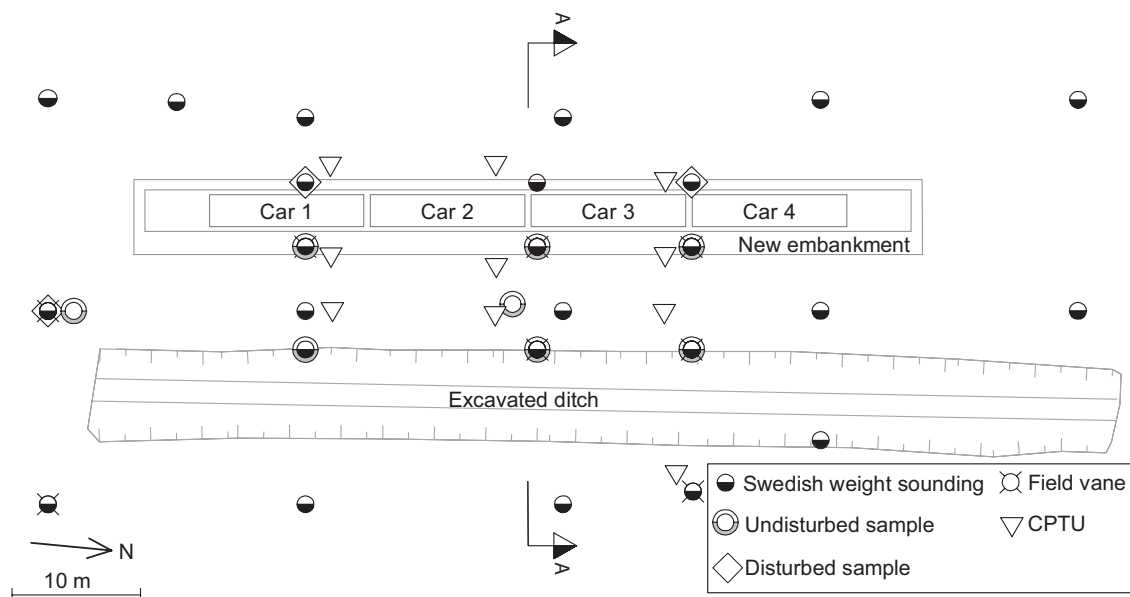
Plan view of embankment test site showing location of soil borings and in situ tests
